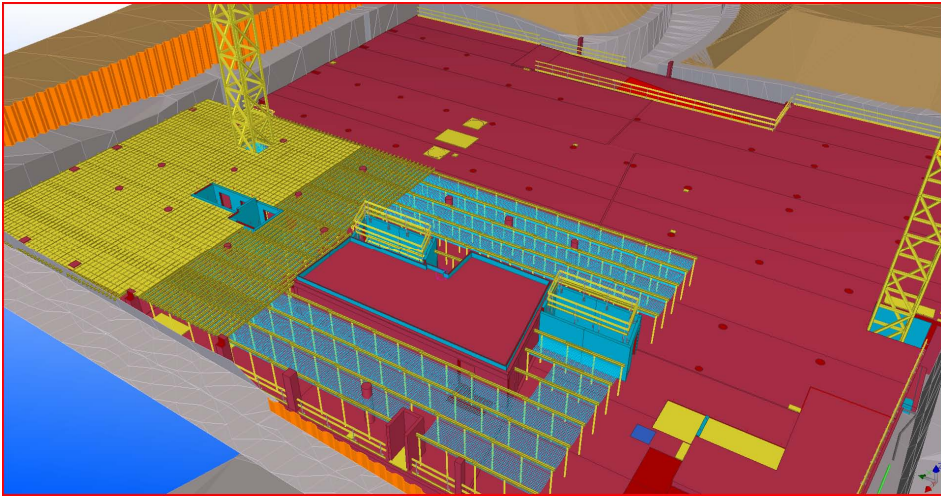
In the fourth phase secondary beams and timber panels of the floor mould system are installed.
